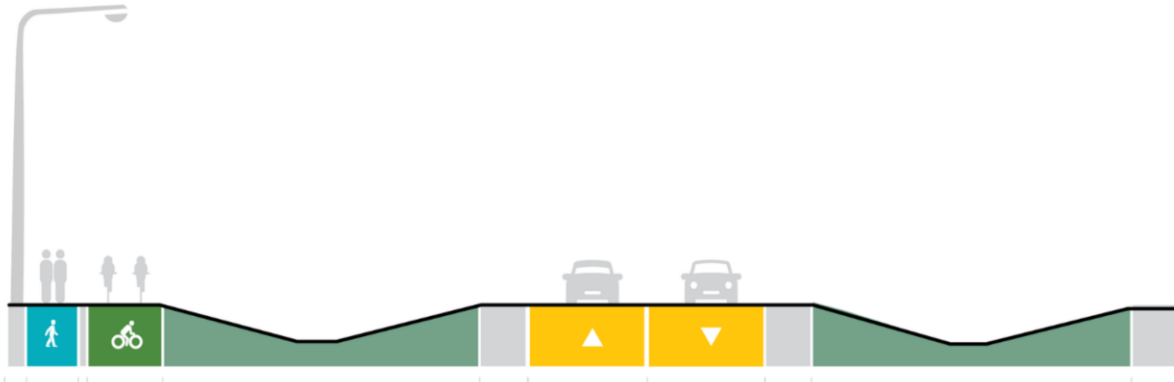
Coatesville-Riverhead Highway typical 33 m rural cross section
